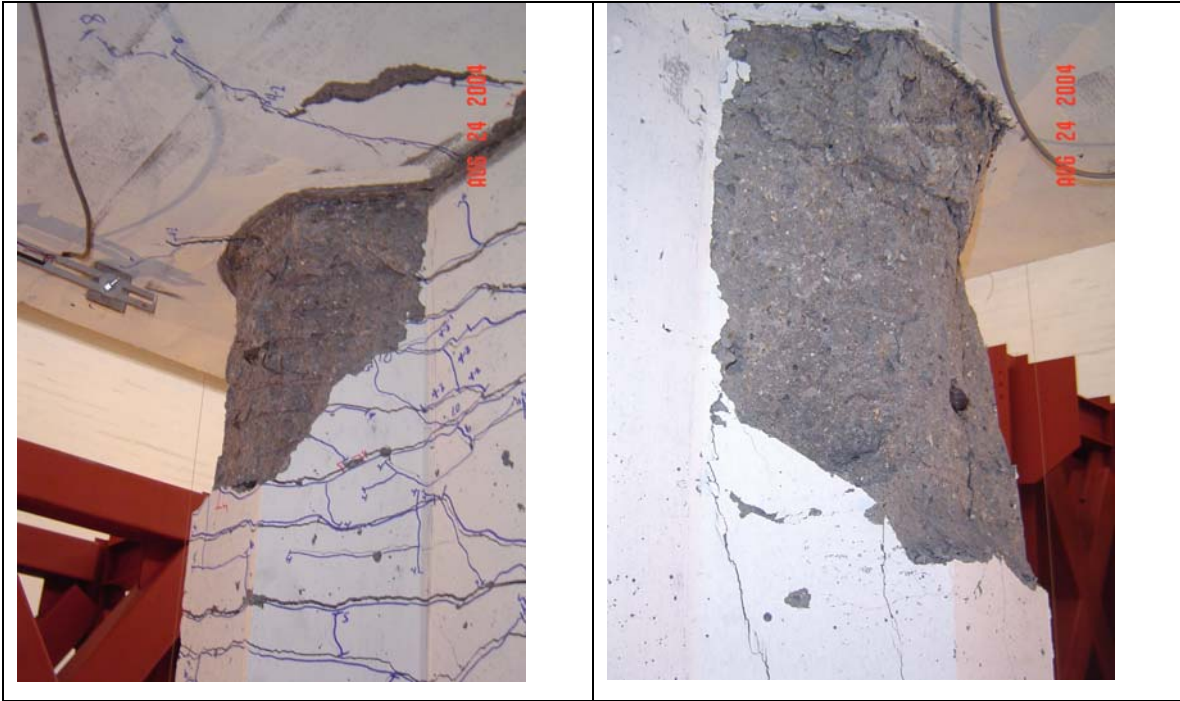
Spalling at top corners at conclusion of testing
